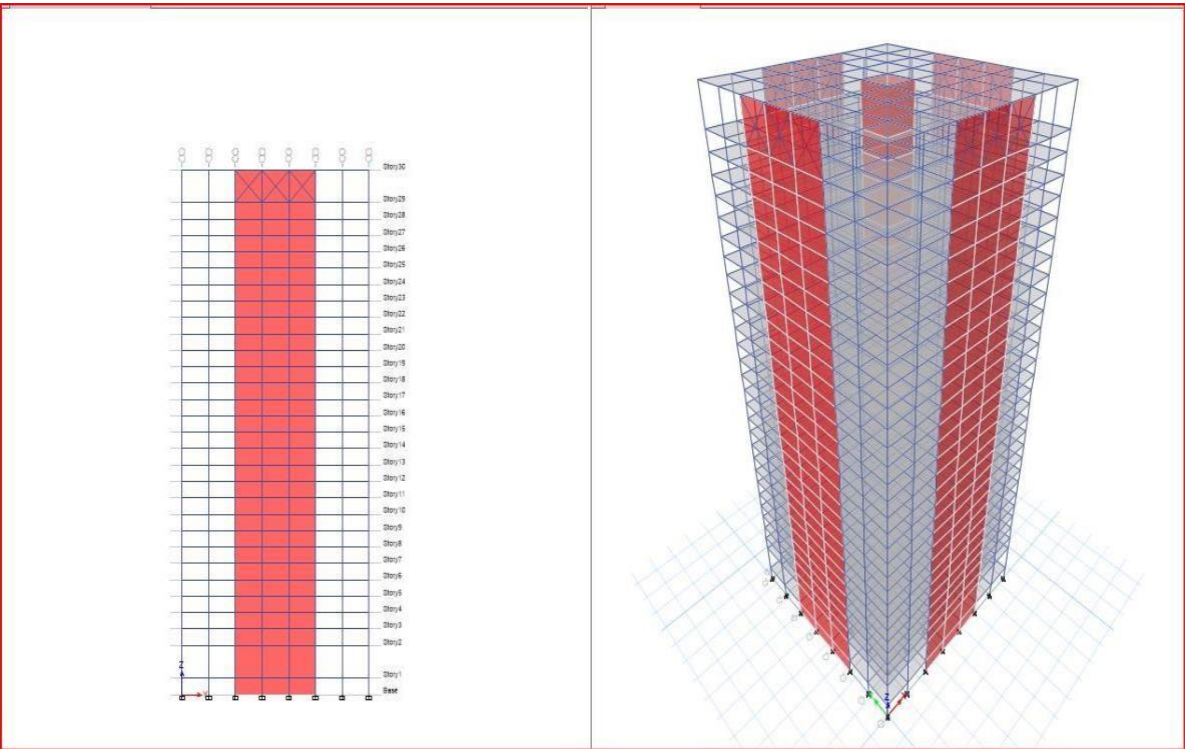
Elevation and 3-D view of Soft Story model with diagonal stiffeners at top for G+30
